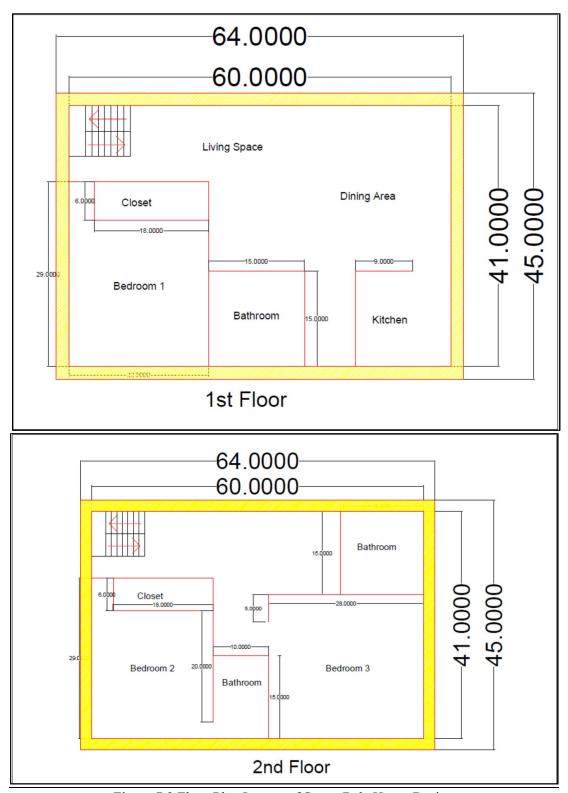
Floor Plan Layout of Straw-Bale Home Design
